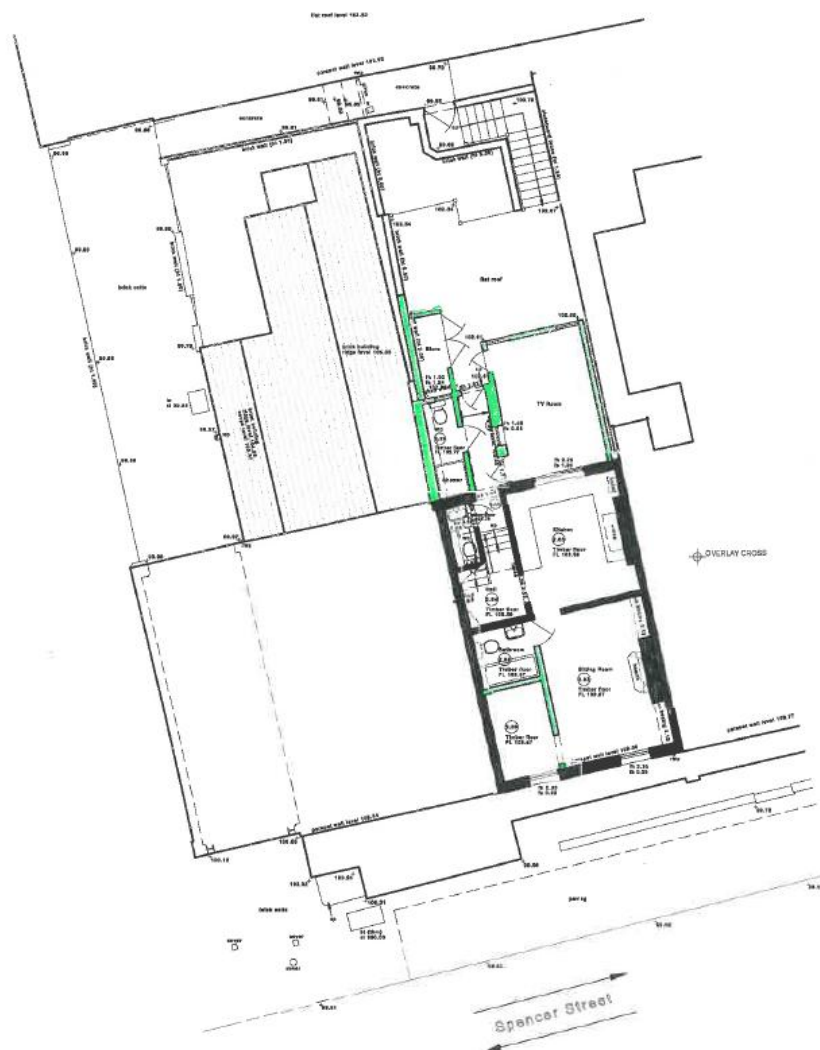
First Floor Plan, with original building in black, and 1980's additions in green.
